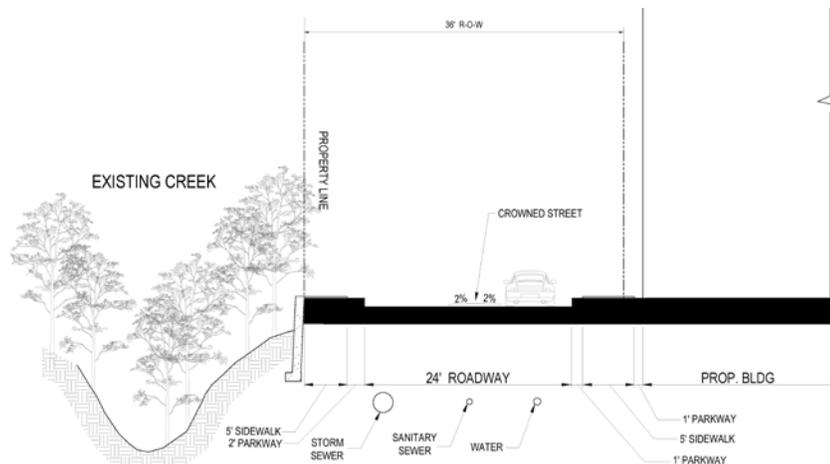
Applicant's Proposed Street Cross Section (Current Request; i.e. August 30, 2016)
